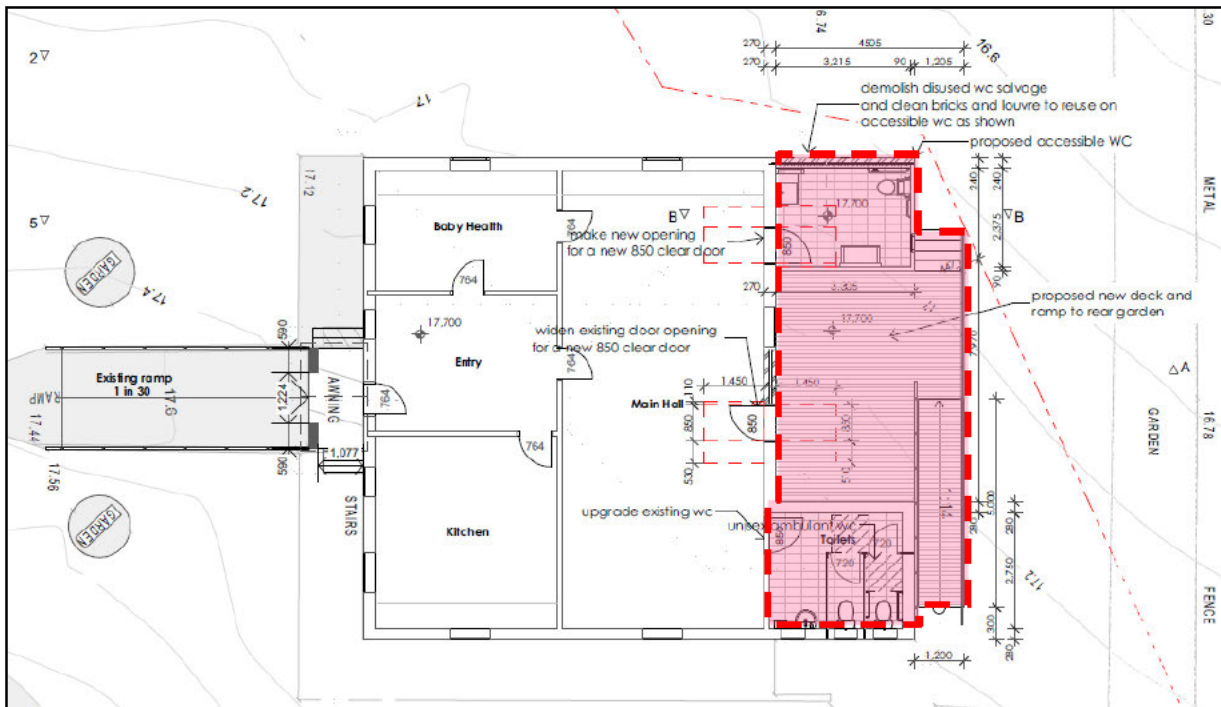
Proposed Floor Plan showing layout of proposal submitted with DA0298/23 (Red outline and emphasis added – not to scale)
